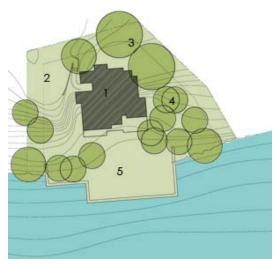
Site Plan - 1. House 2. Parking 3. Garden 4. Garden 5. Front Lawn
